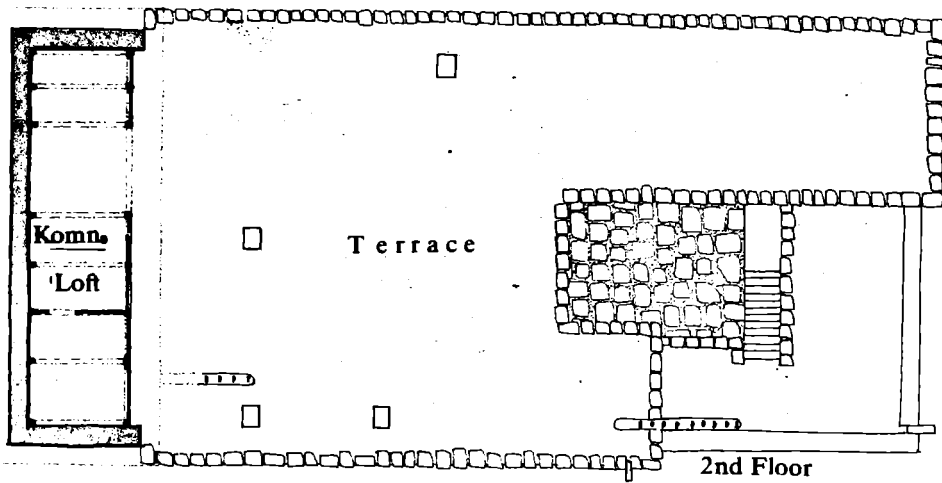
Plans of Bikas Gauchan's house (Taglung)
